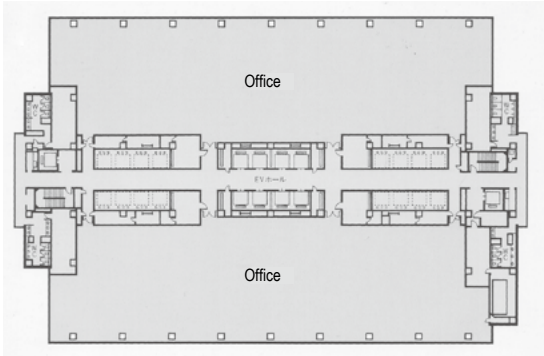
Typical floor of an office building with an open core system (Building B and C of Shinagawa Intercity, designed by Nihon Sekkei)
